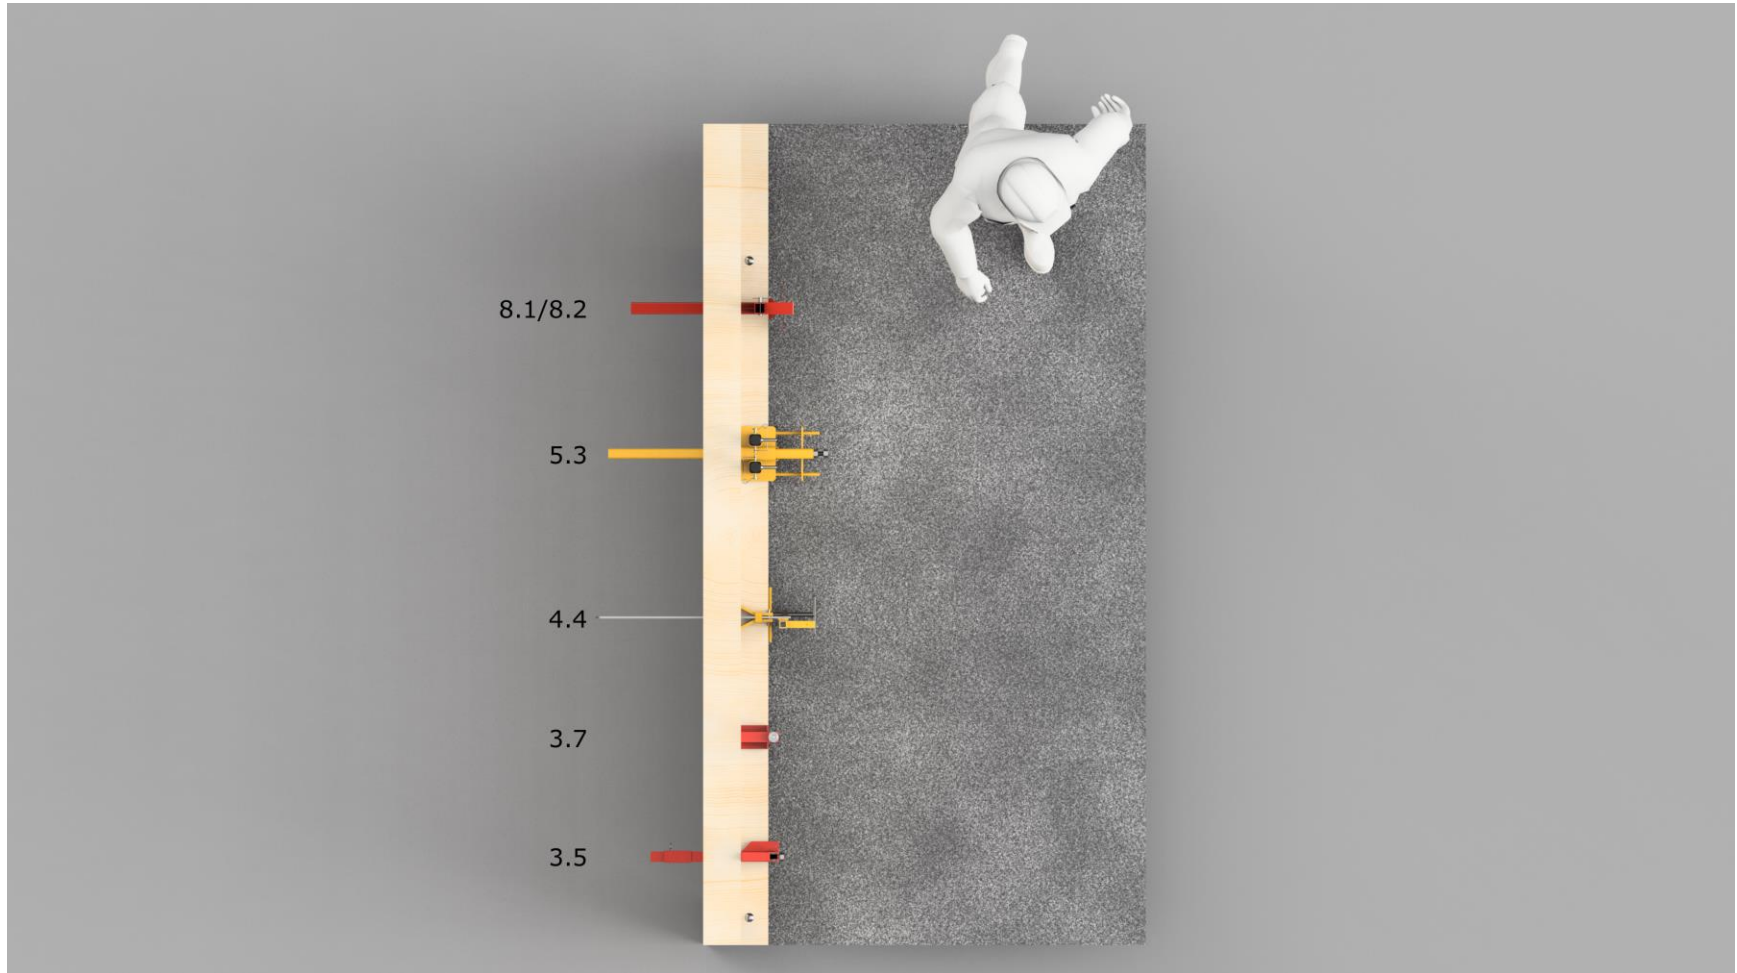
Guardrail Type 22, wheel guard fit; view from the top
